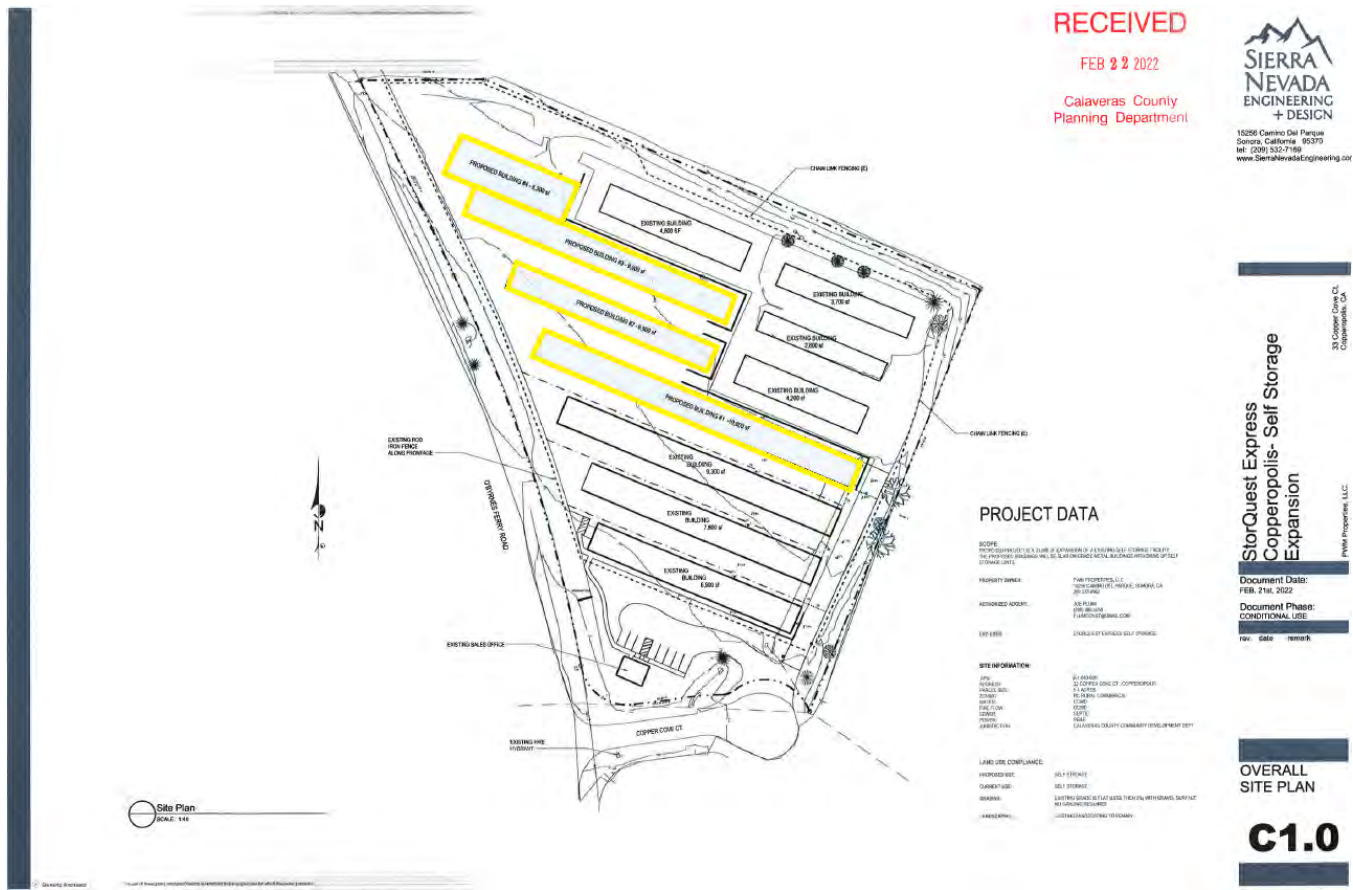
Site Plan (Proposed buildings outlined in yellow)
